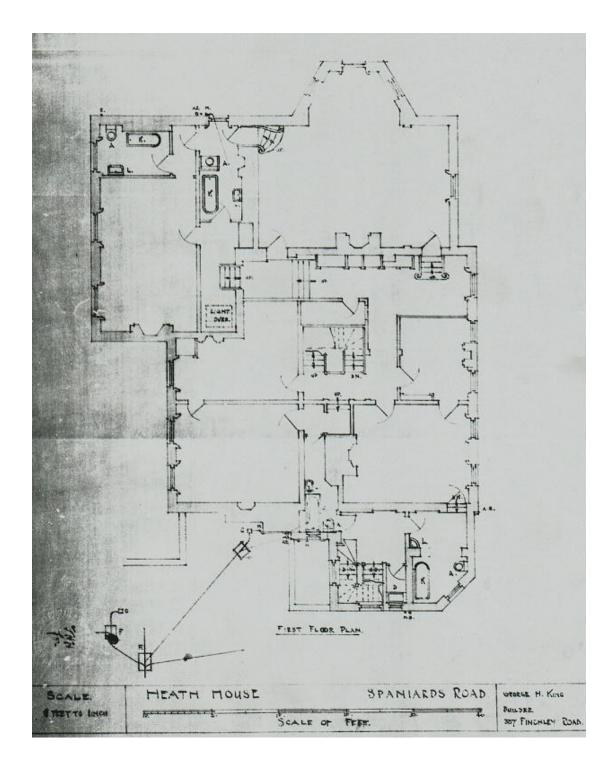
A plan of the first floor of Heath House as existing in 1935 (Camden Drainage records)
